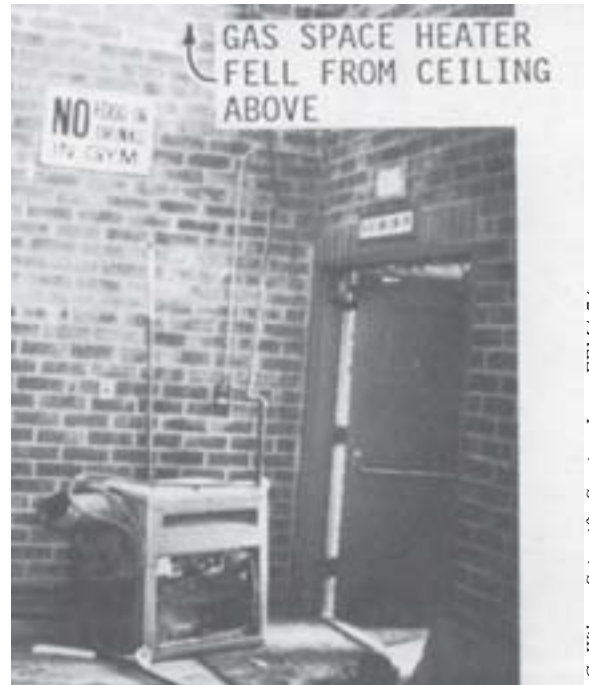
Equipment that is not well connected to ceilings above can fall and cause serious injuries.
